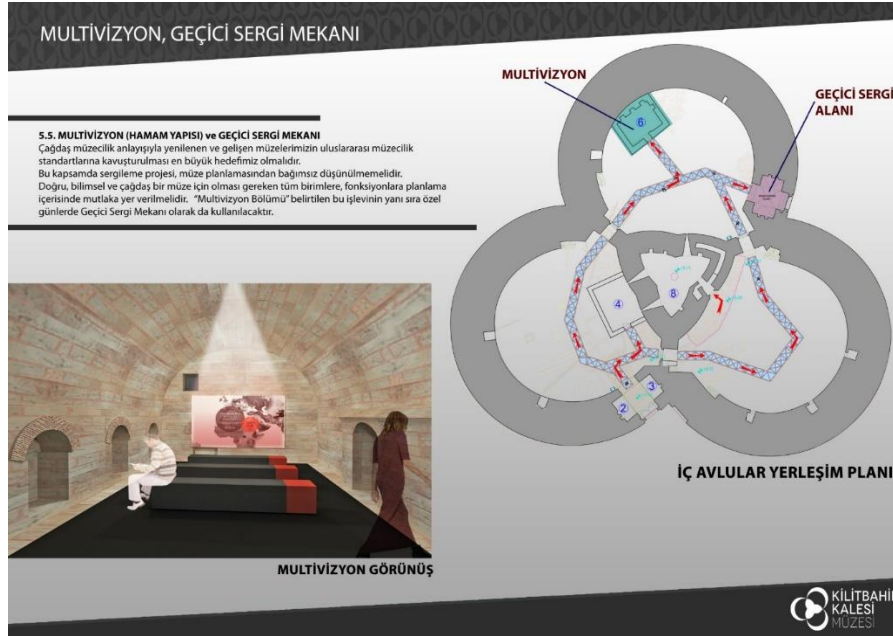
Multivision-Temporary Exhibition Area Plan, K. Duyar.
